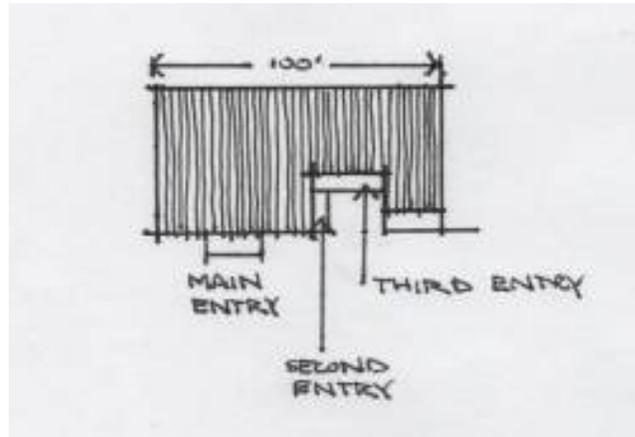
(A) – Building with facades longer than 100 feet should have additional entryways.
